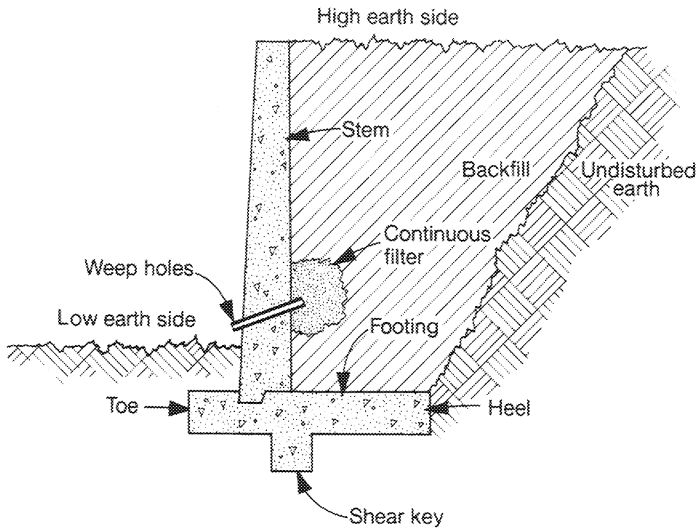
Typical detail of a cantilever retaining wall.
